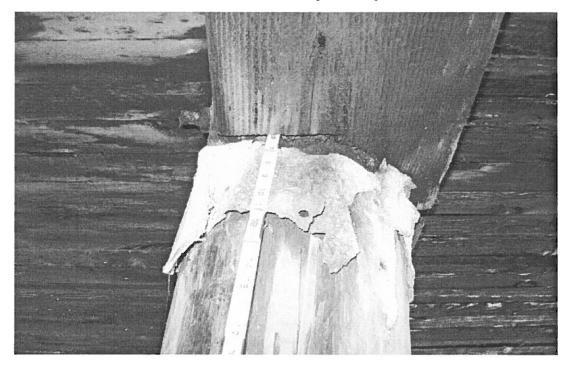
Looking up at Pier 1 Cap Beam, CL of Splice off Pile
